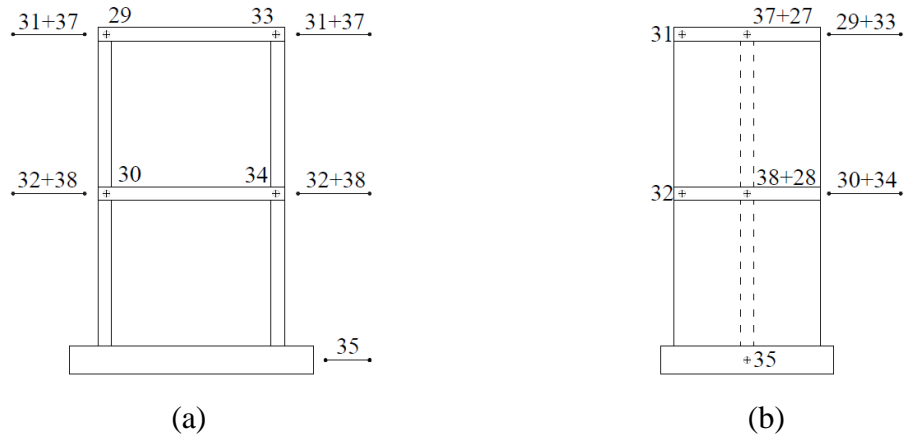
Instrumentation for HSW specimen: (a) web plane; (b) flange plane.
